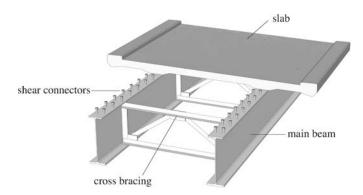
Schematic view of the elements forming the superstructure of a composite twin girder bridge.
